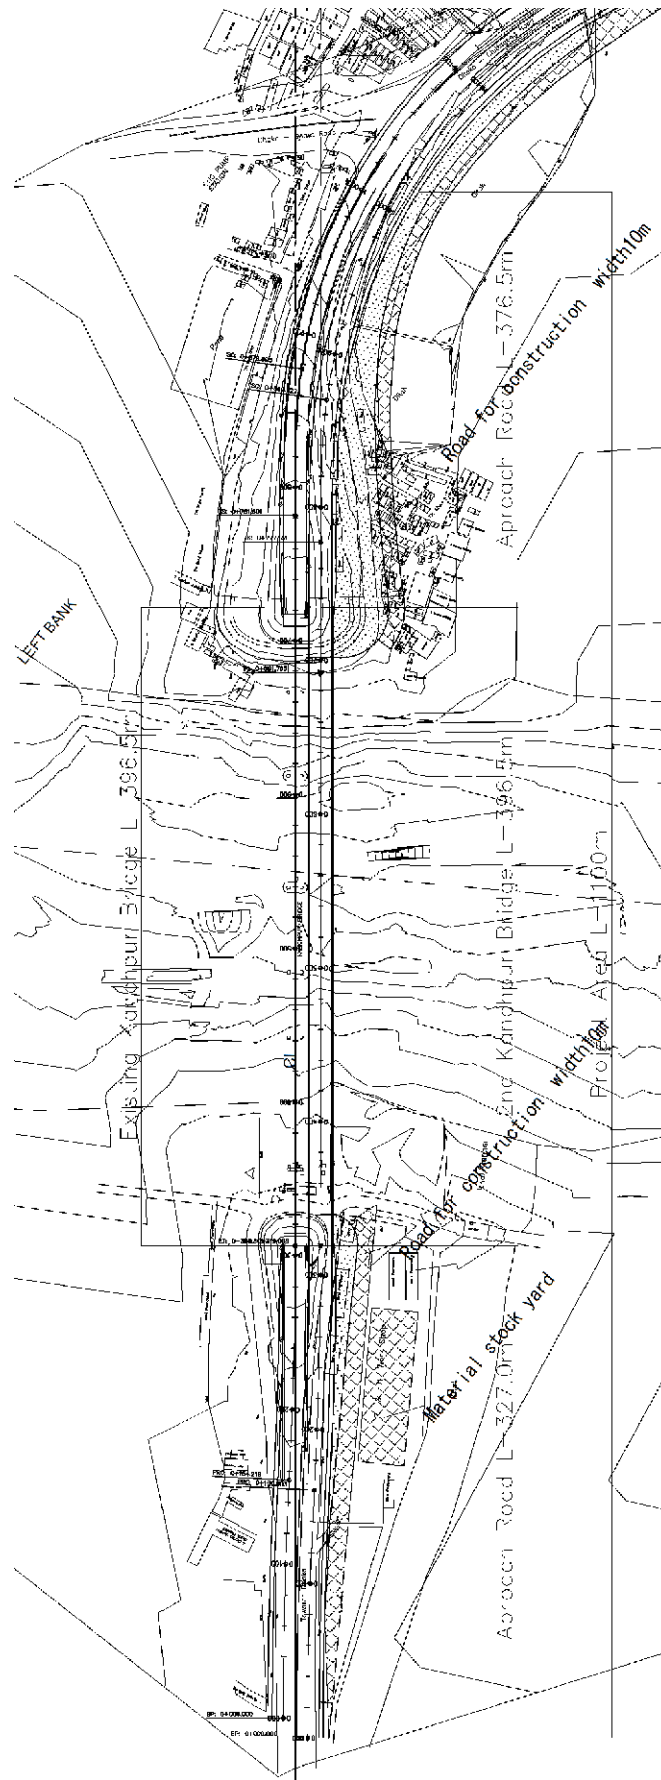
Construction Yard and Temporary Road at the Kanchpur Bridge Site
